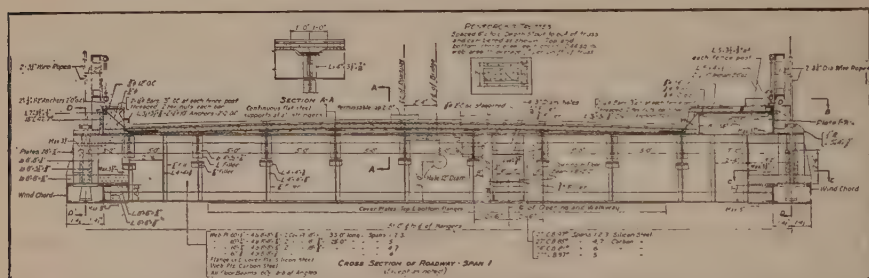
DECK SECTION OF HIGHWAY BRIDGES
